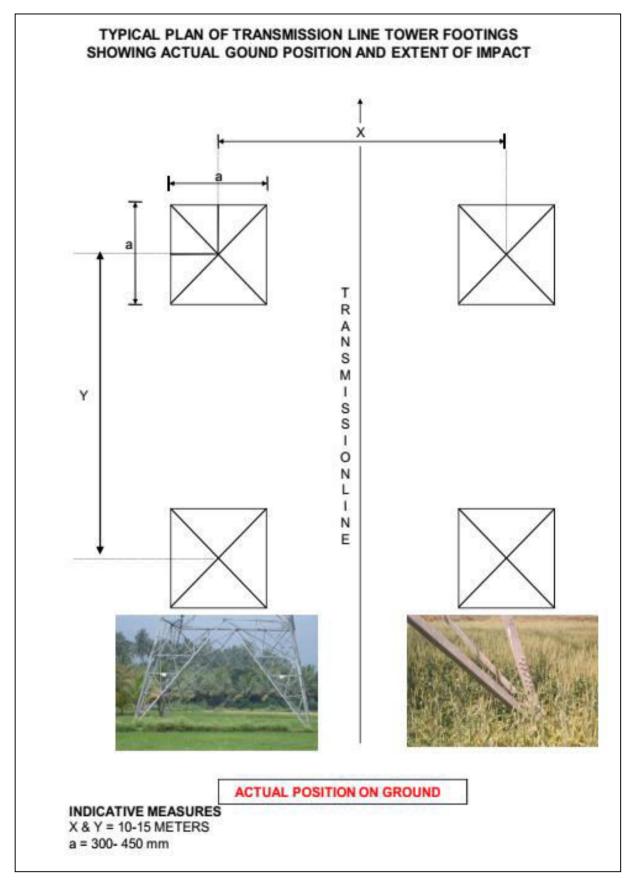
Typical Plan of Transmission Line Tower Footing Green Circle Inc.
